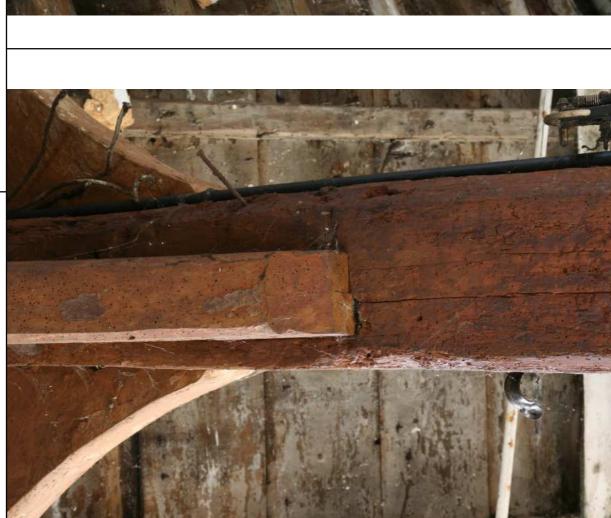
Building 3, detail of SE face of aisle post, showing offset mortice
